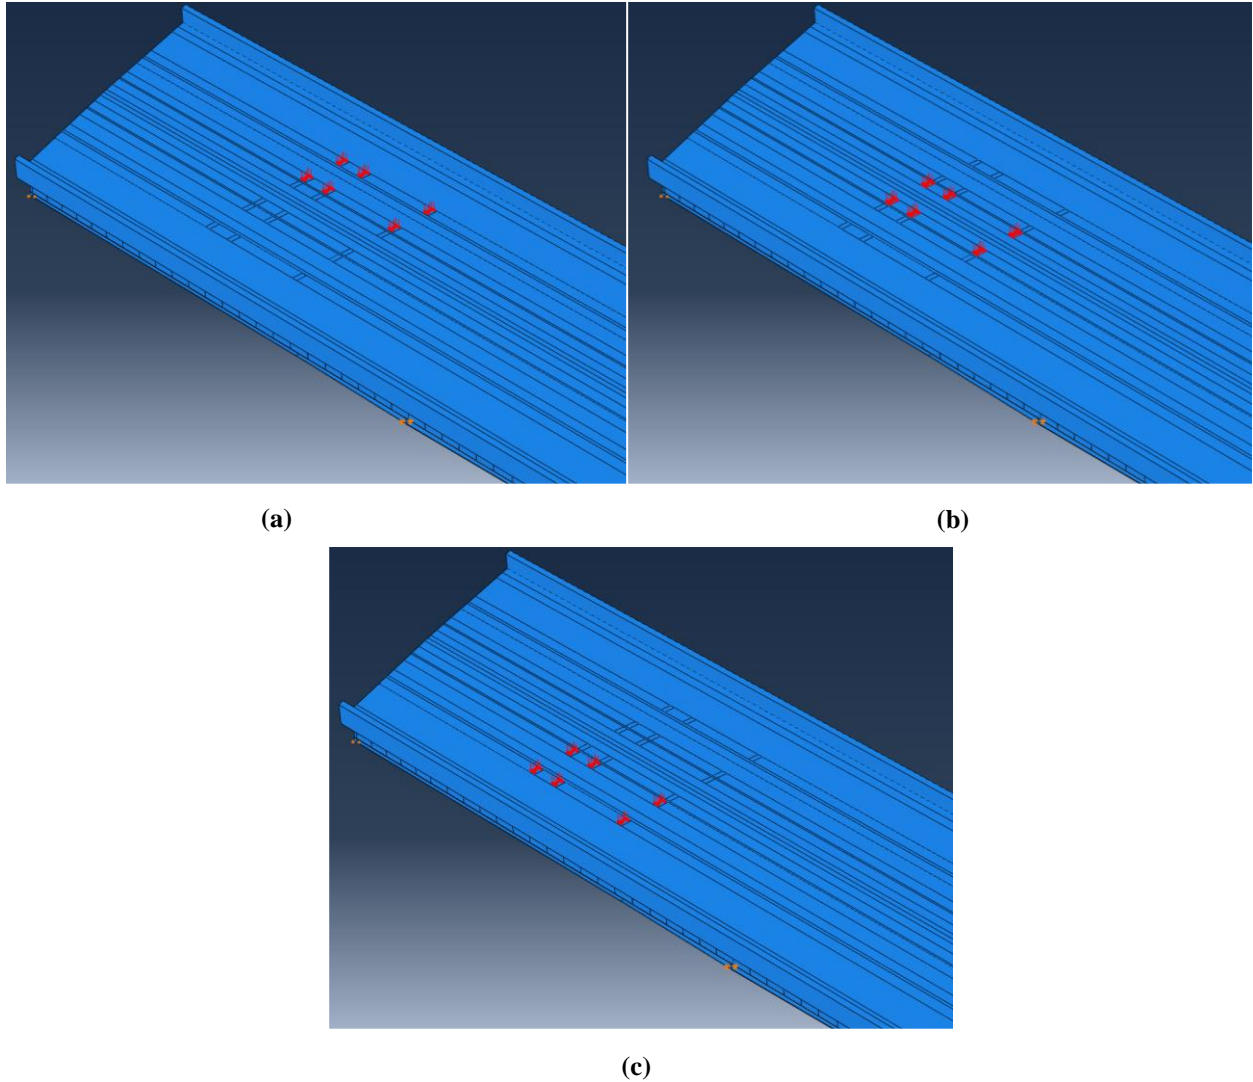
Truck load modeled in (a) west lane (b) bridge center (c) east lane.
